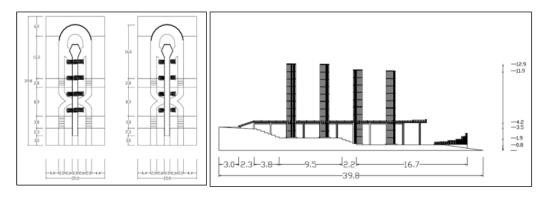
Site Plan and Section of Grangsil Photo Spot, as Contur Respon Design (Author, 2020)
